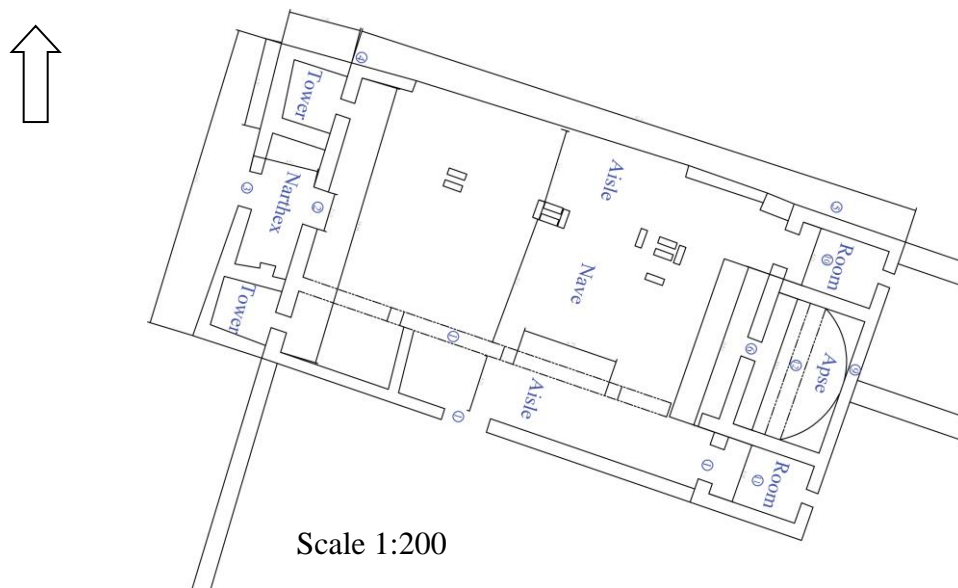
West Church two-dimensional detailed plan drawing. Sources: by Author.
